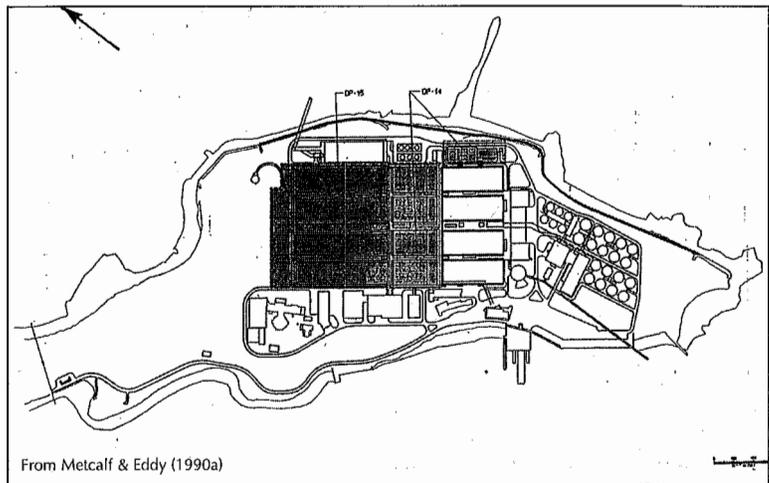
Layout of the Deer Island Sewage Treatment Plant as proposed.
